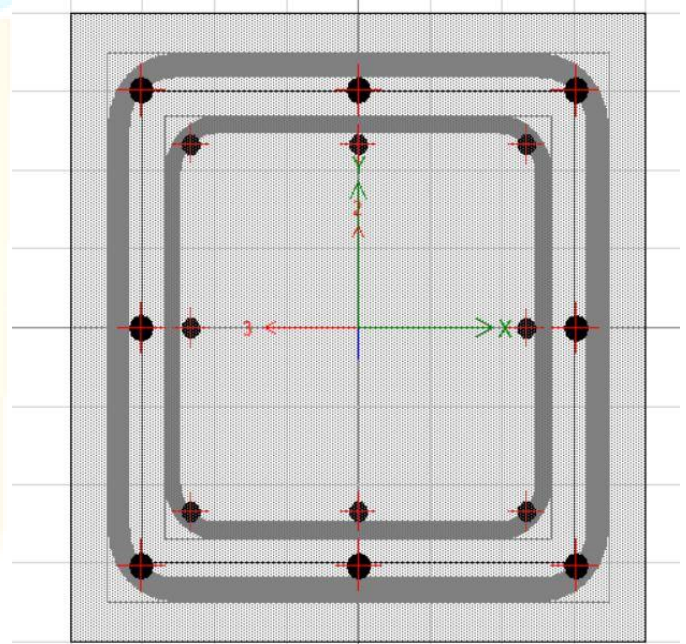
Column Steel Retrofitting Size – 300 mm x 300 mm
